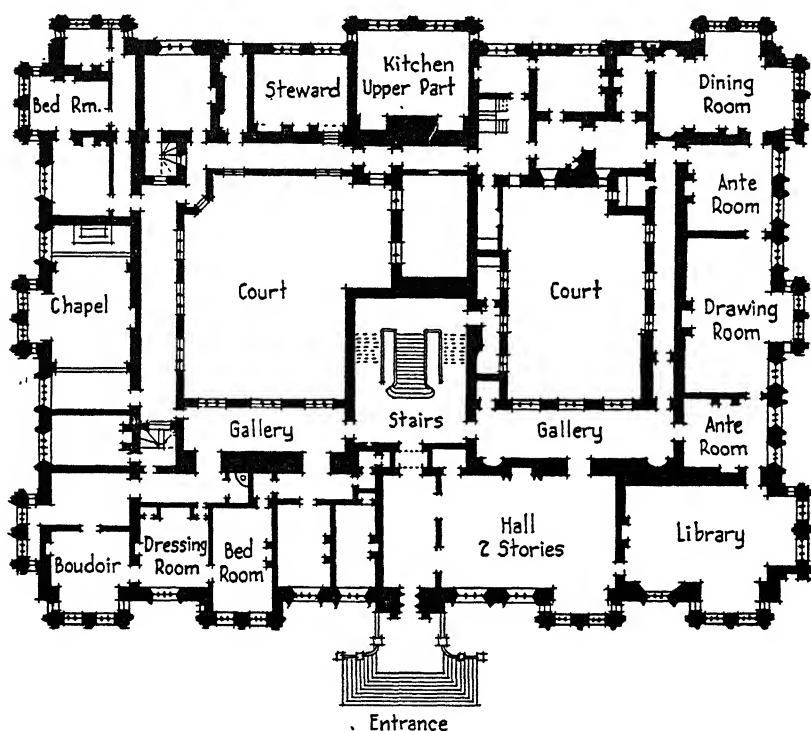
PLAN, LONGLEAT HOUSE, WILTSHIRE (1567-1580)
